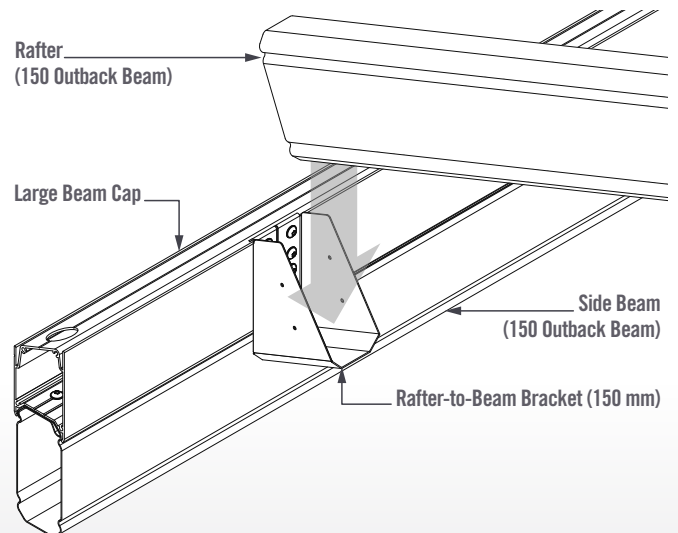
LARGE BEAM CAP - 150 SIDE BEAM - 150 RAFTER
